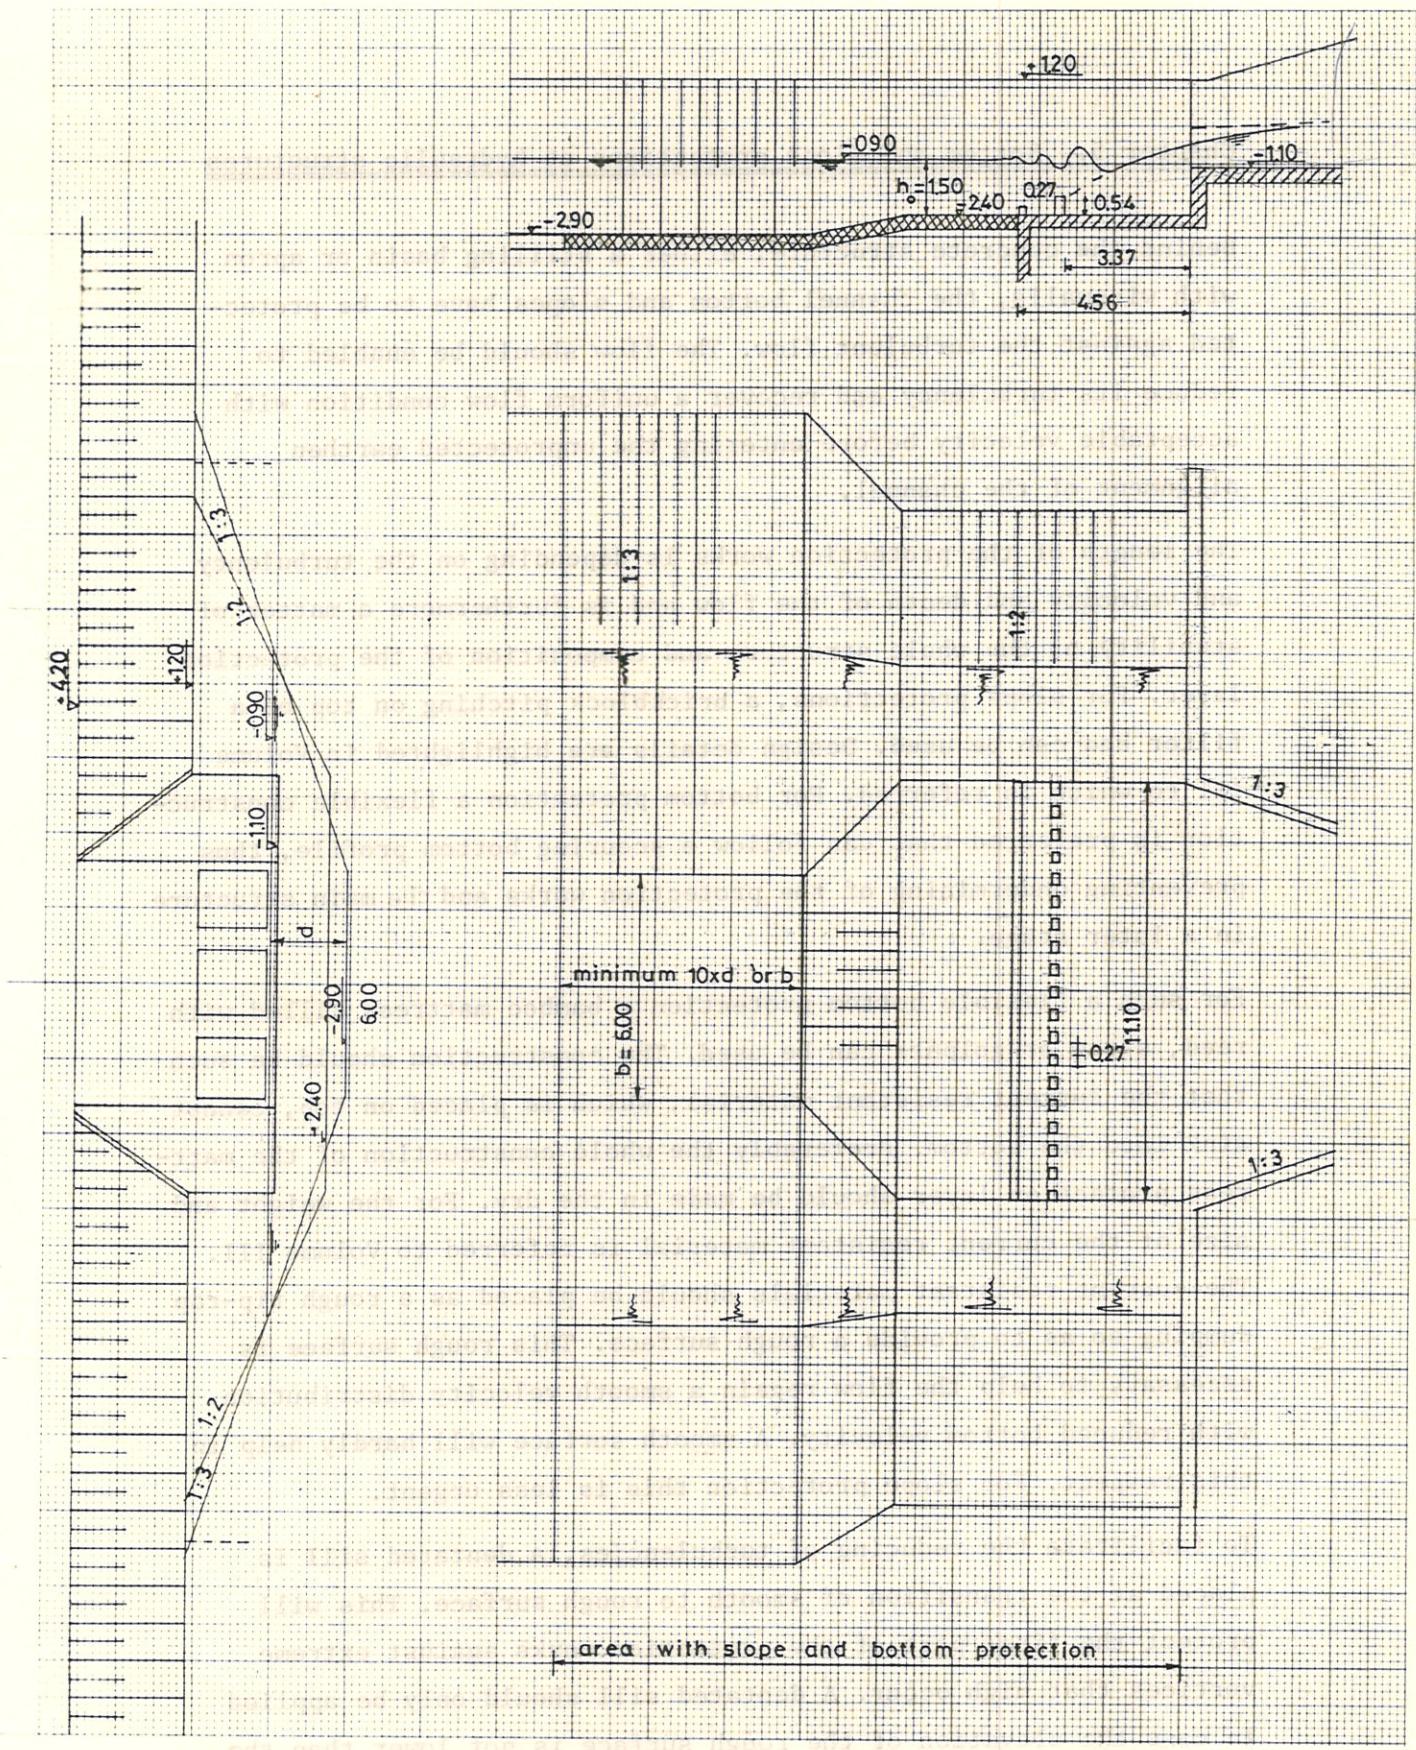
Lay-out of bottom and slope protection for a drainage sluice with apron and depressed baffle block floor.
